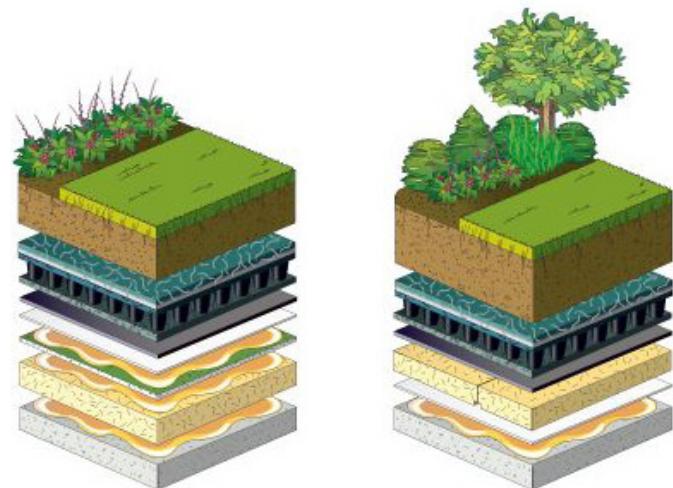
Green roof layer system of an intensive and extensive green, illustration from Roof Garden, Charlisle
